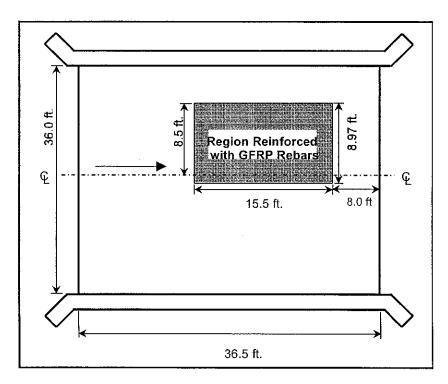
Plan View of Bridge Deck Showing the Location of the GFRP Rebars
